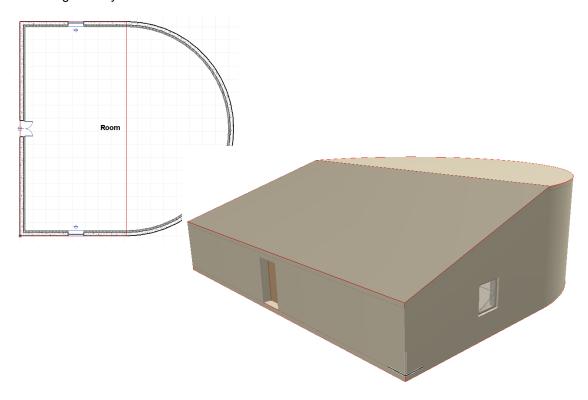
One Story Non-rectangular Building with Curve Wall and Sloped Roof
